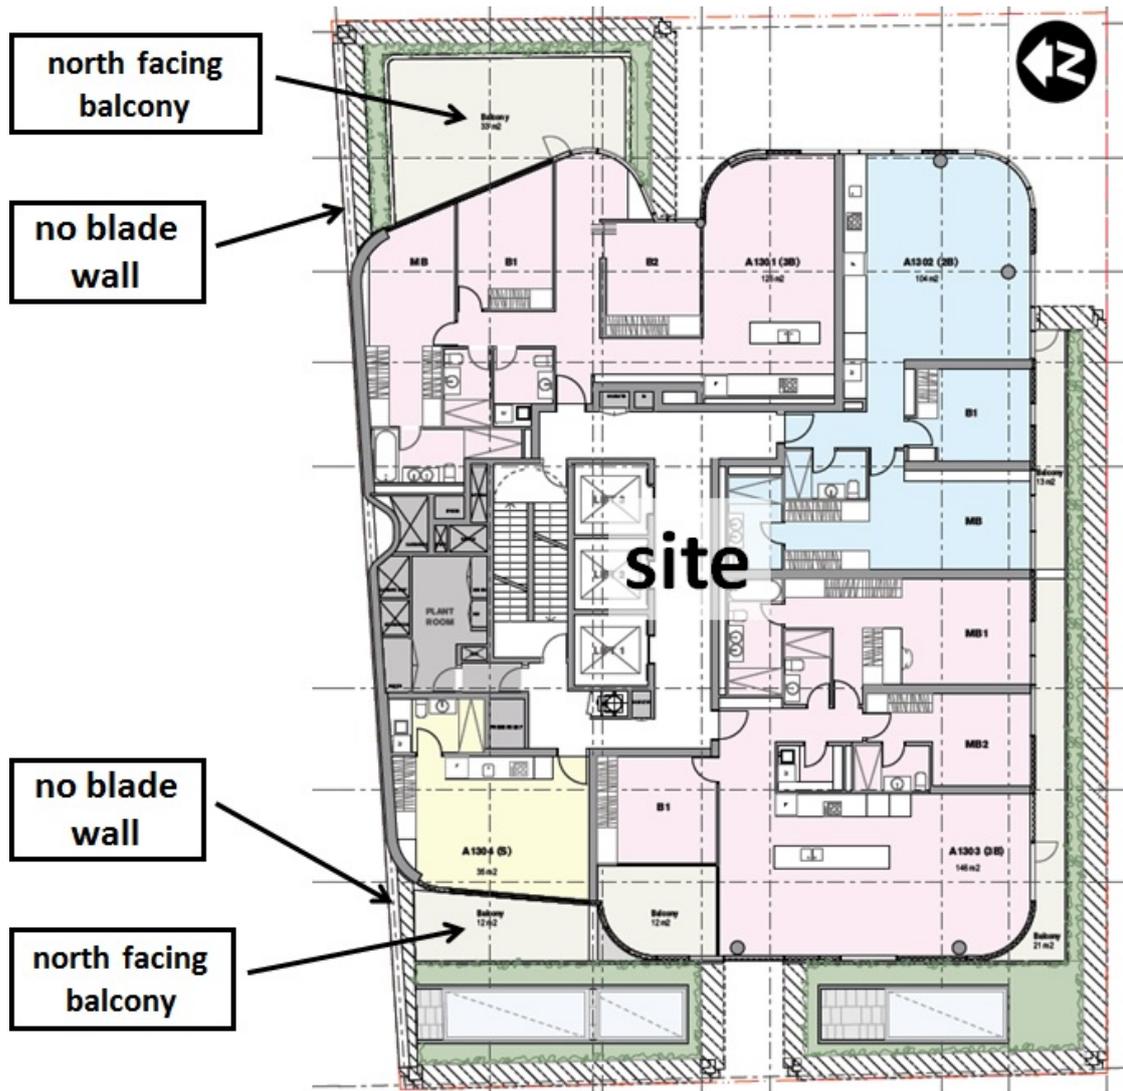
Illustration of adequate separation at western facade of tower level 14.
